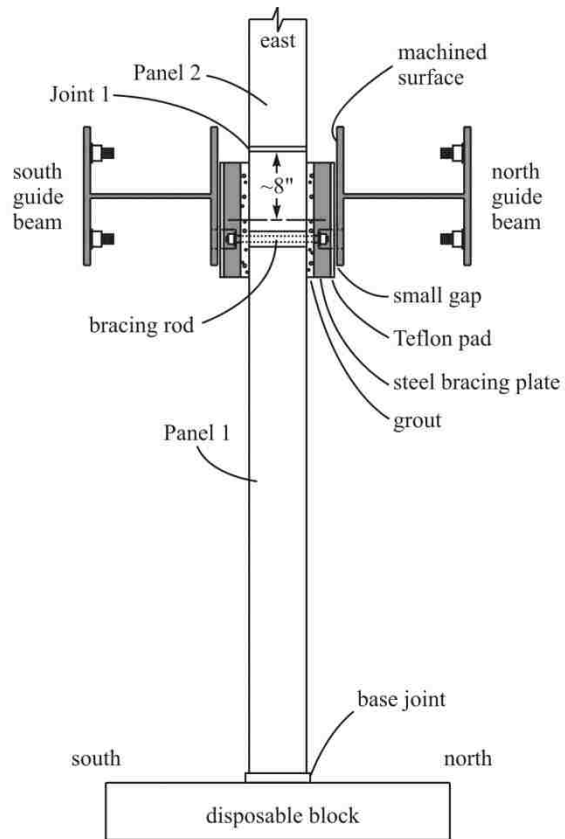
Out of Plane Bracing (Perez et al. 2004)
